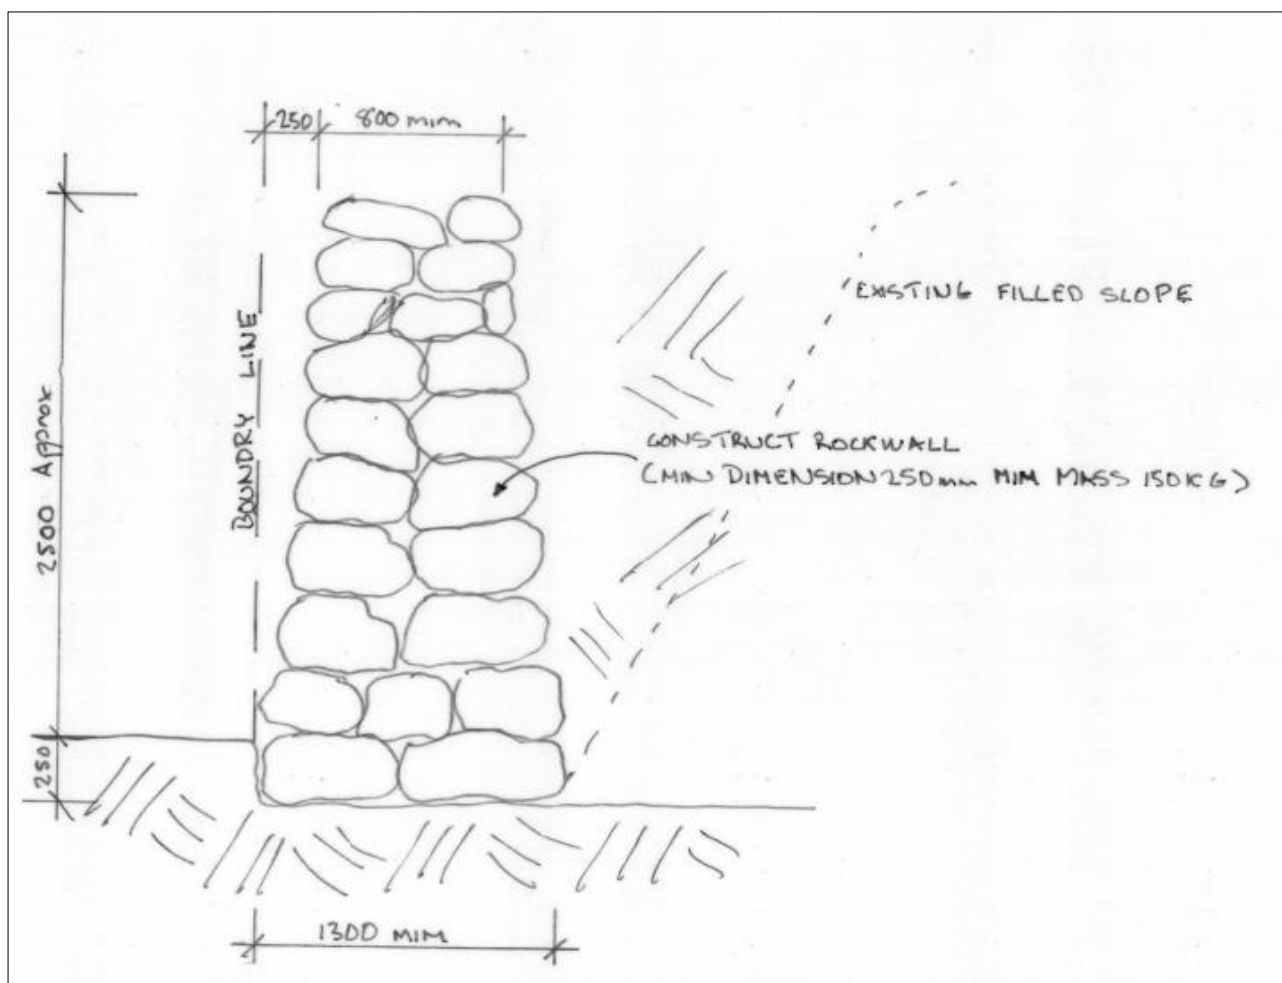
Rock retaining wall details (Thylacine Design, 2020)
